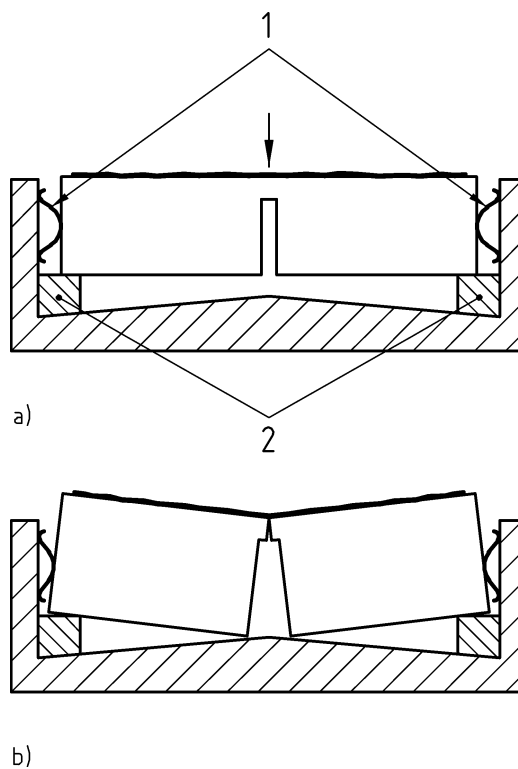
Jig for generating cracks with a given crack width
